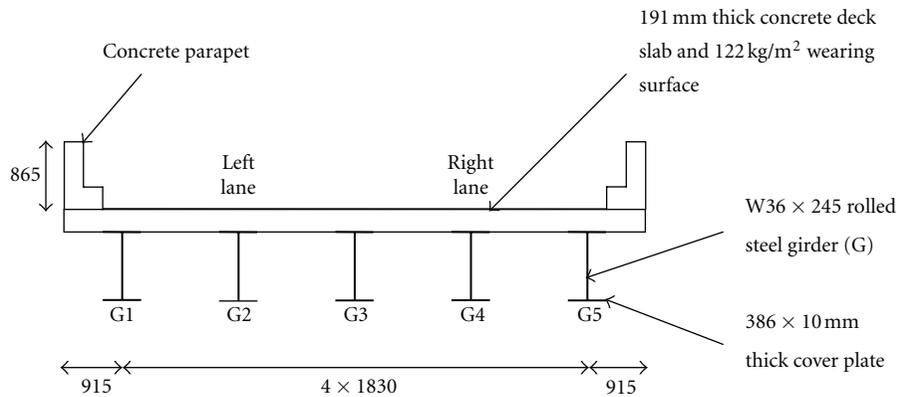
Typical cross section of two-lane rolled steel girder bridge (unit: mm).
